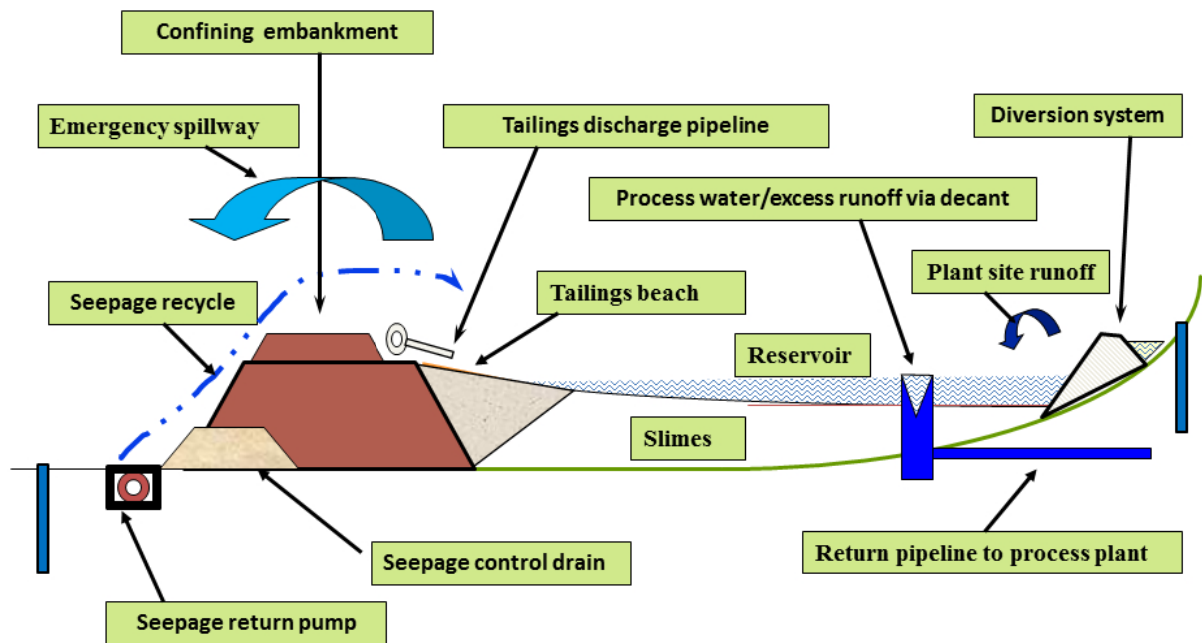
Typical section through a tailings management facility, TMF (from Cambridge, 2010)
